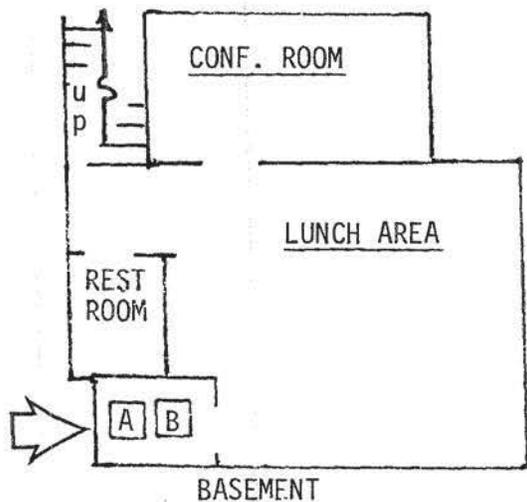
FLOOR PLAN OF COMPUTER OPERATIONS AREA
